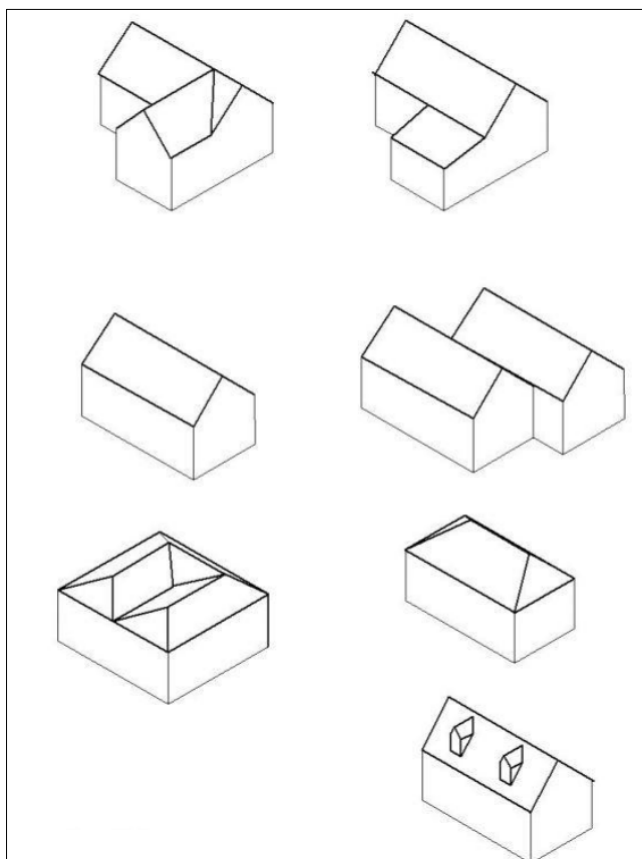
Roof forms as required by clause NOR-S6.7.2 A1
